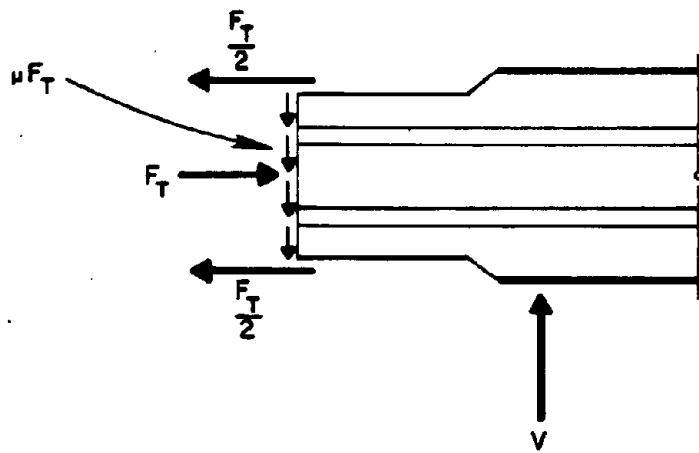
Frictional Forces on Barrier Face When Connection is in Shear.
